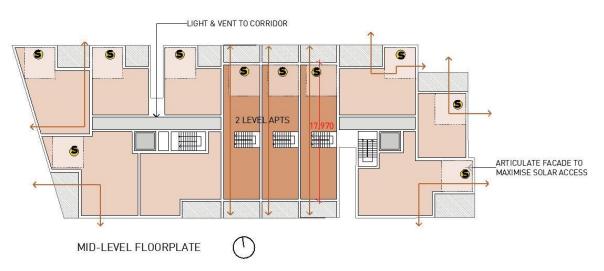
EXAMPLE 22.4M WIDE NORTH FACING FLOORPLATE
